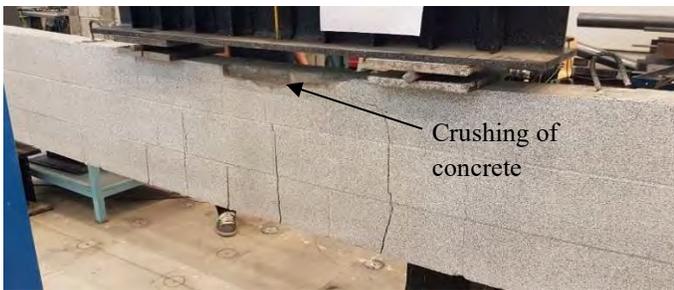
Failure mode of control beam (beam without stirrups)
